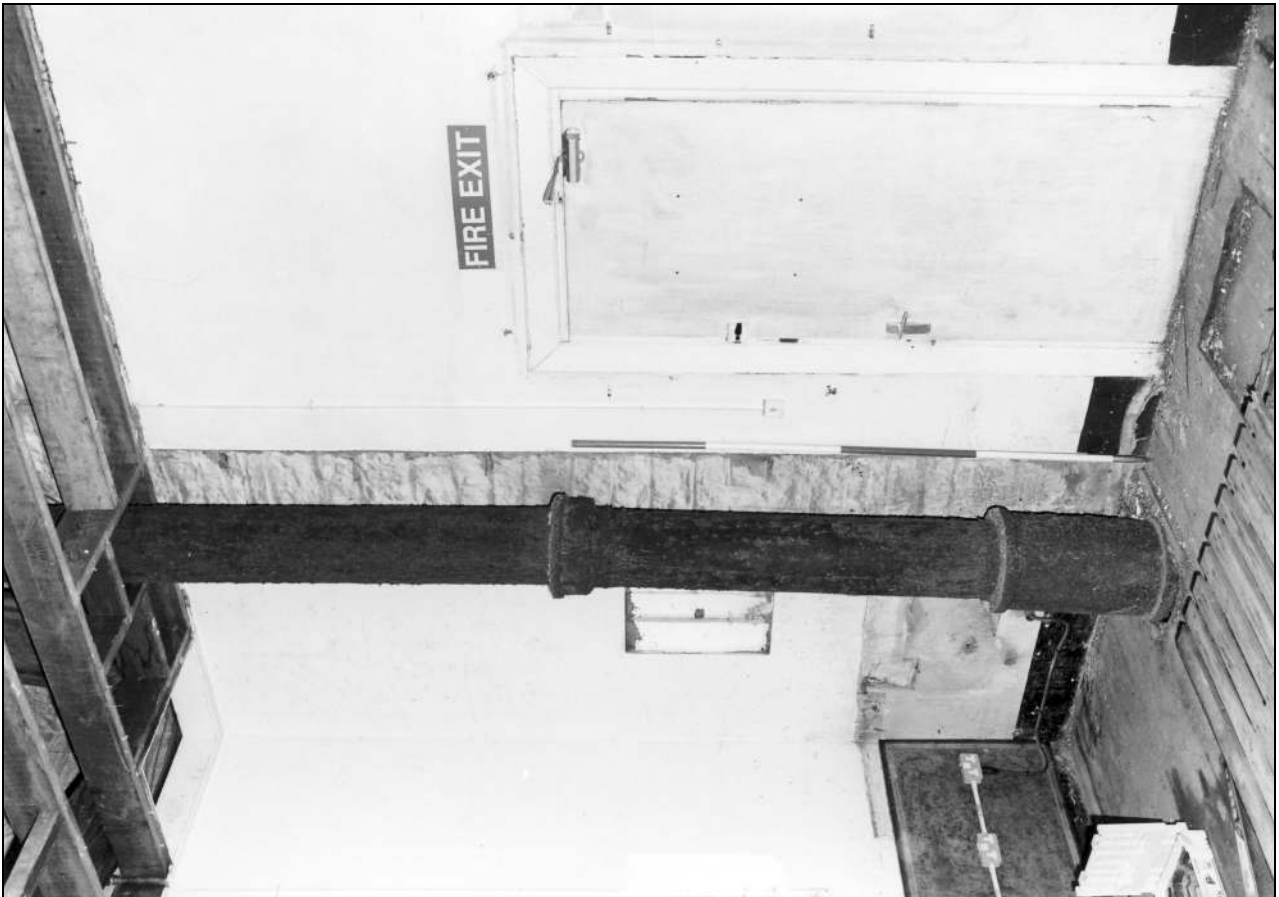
Bay 2: vertical pipe (outlet from tank – pipe no 4), in west side (film 4, frame 8)
